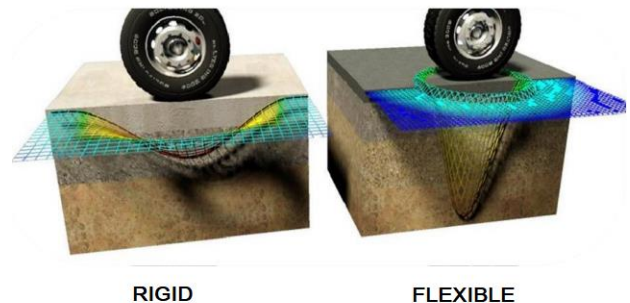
Subgrade behaviour: rigid pavement vs. flexible pavement. [2]
